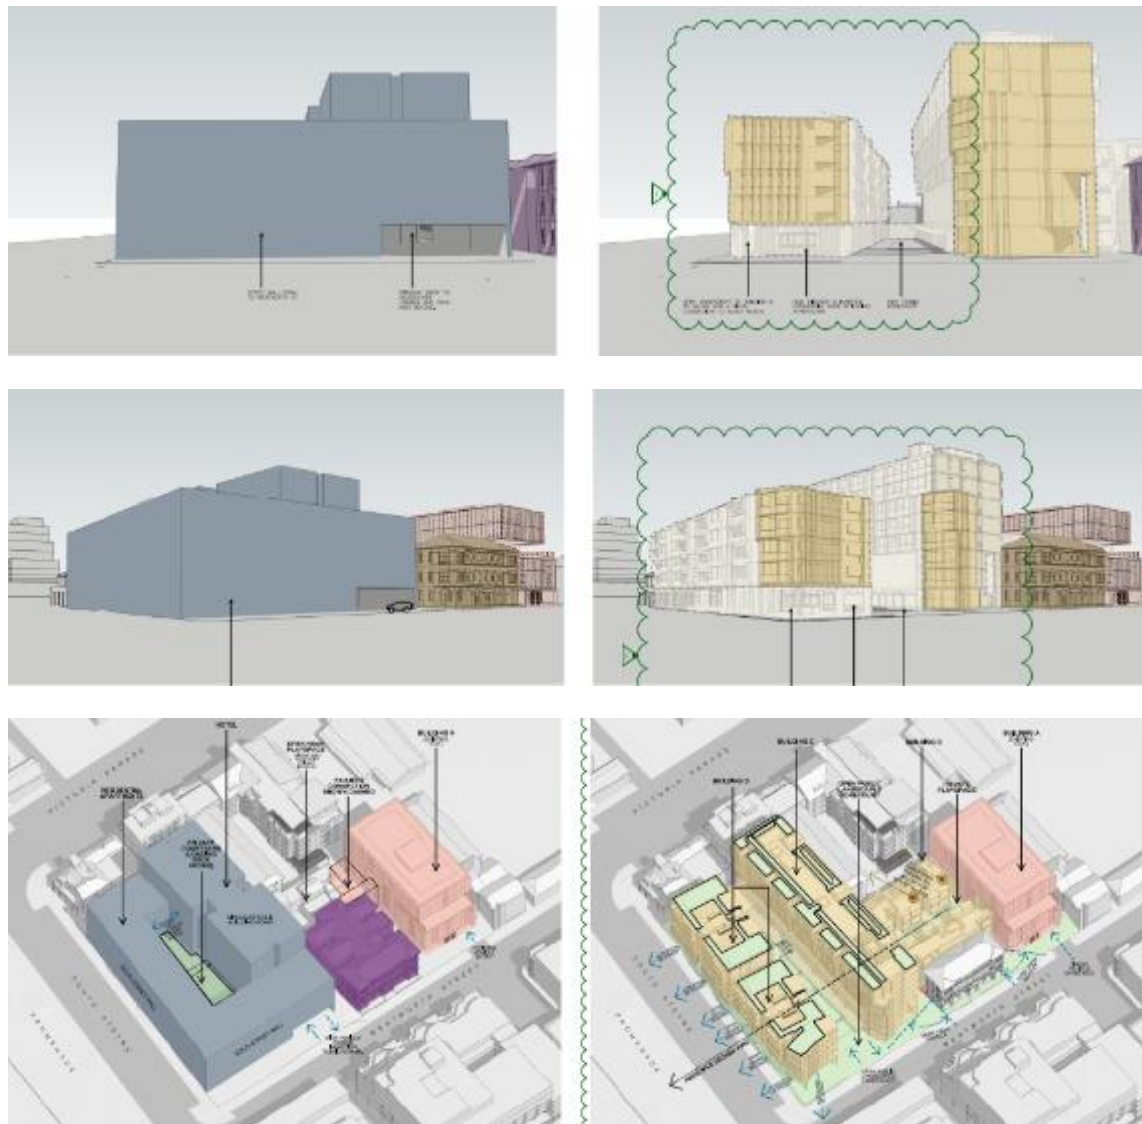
Plan extracts S75W-1352(E) - S75W-1354(E) showing superior streetscape outcome associated with the further modified Wentworth Street building setbacks
